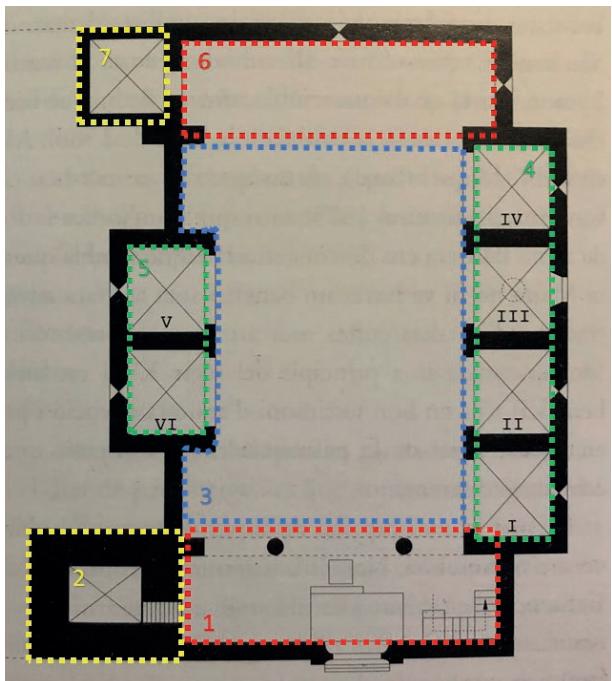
Indoor stationing plan. (Source: Moral, Sergio).
